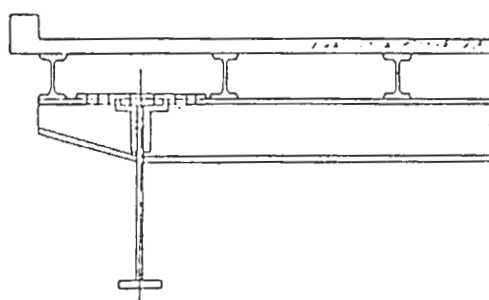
Transverse Cross Section of Lehigh Canal Bridge
